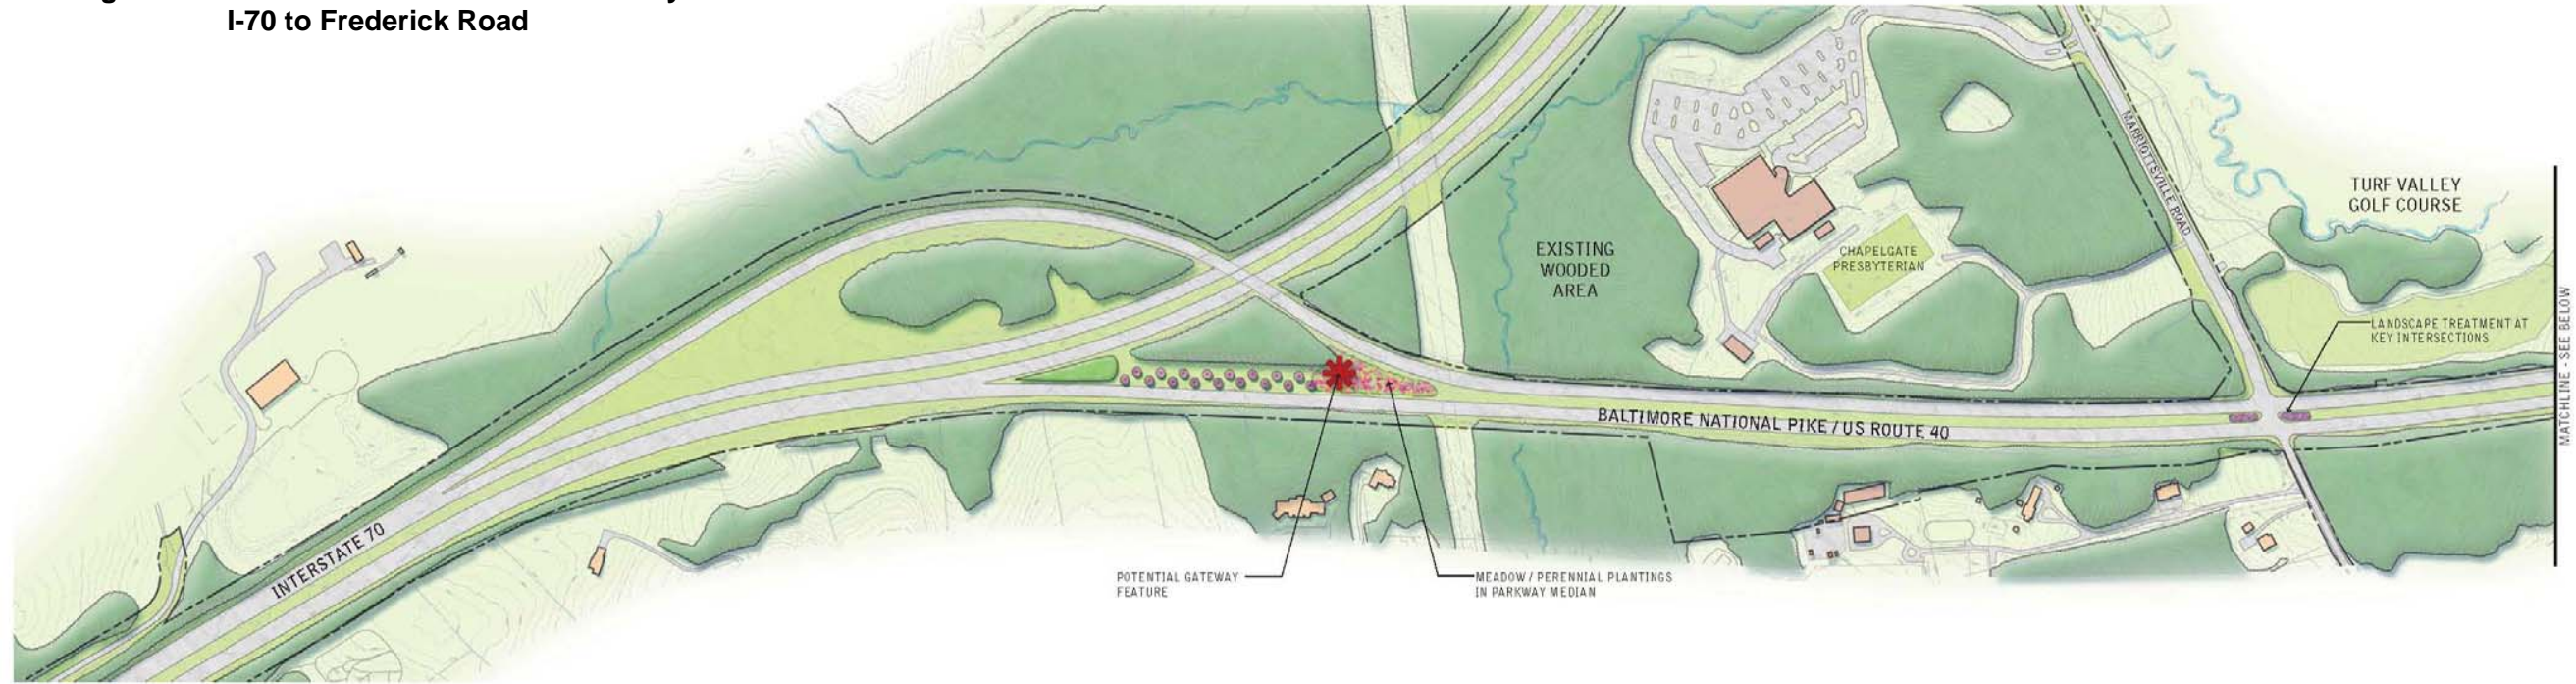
Illustrative Master Plan – Suburban Boulevard Section
